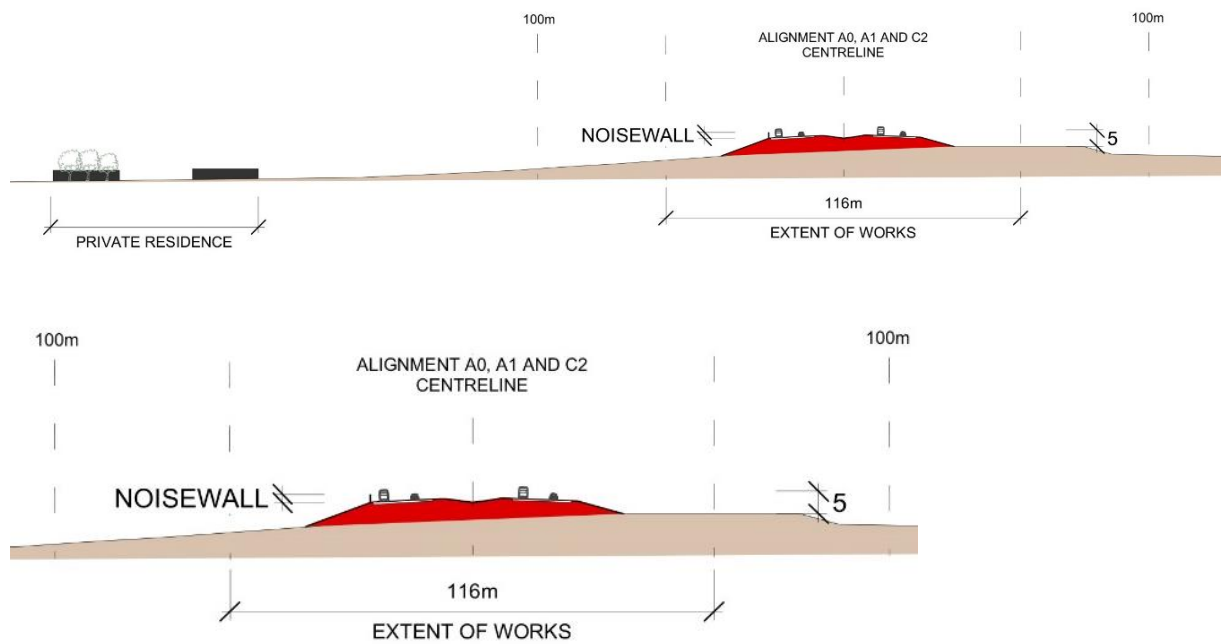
Cross Section No. 4 – Packhams Lane east to Alignment (and close up-section)
